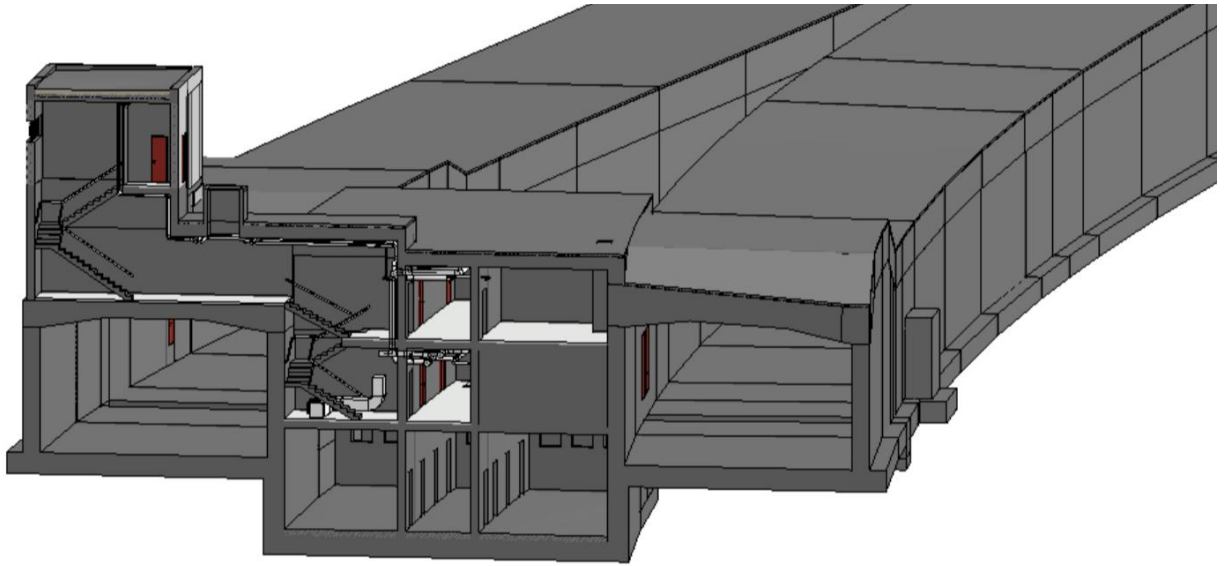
Cross-section of the 3D model of the TGC facility and tunnel structures
